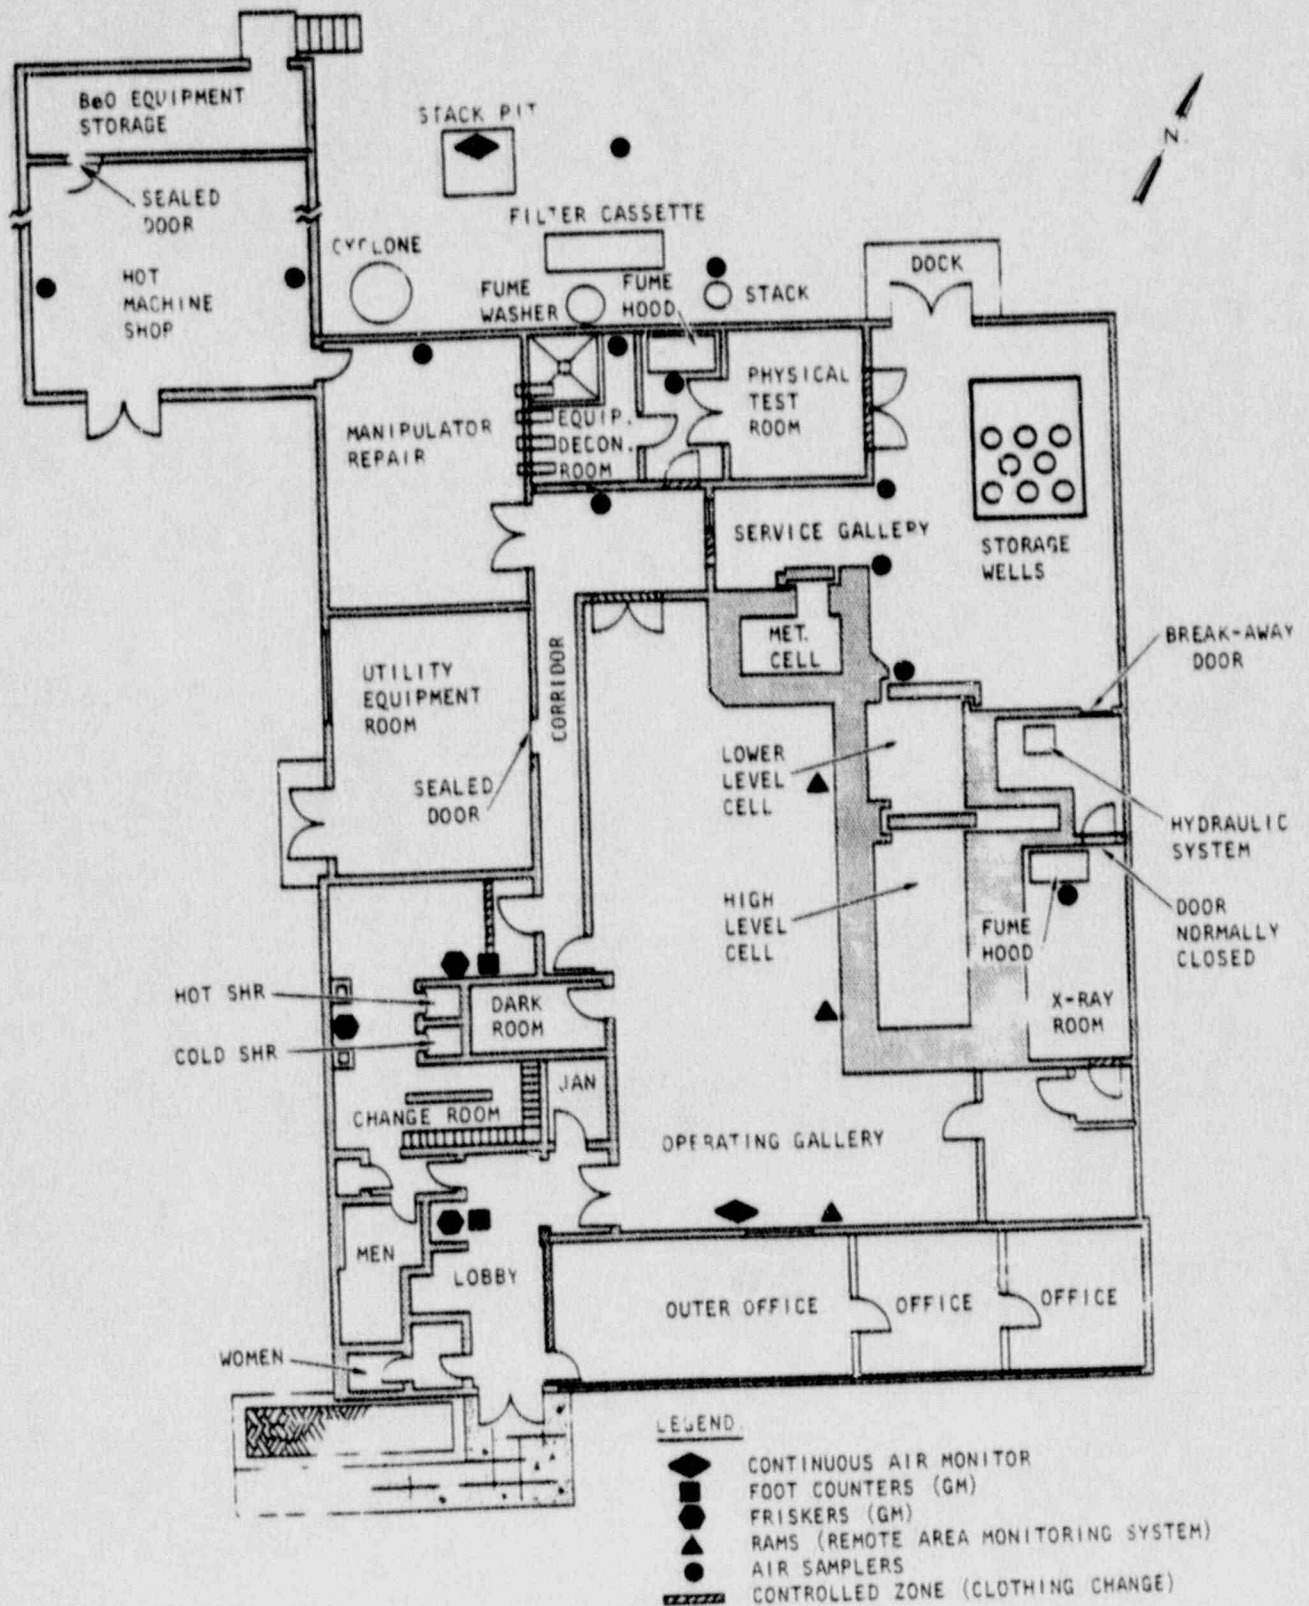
3.5-1 HOT CELL FACILITY FLOOR PLAN
